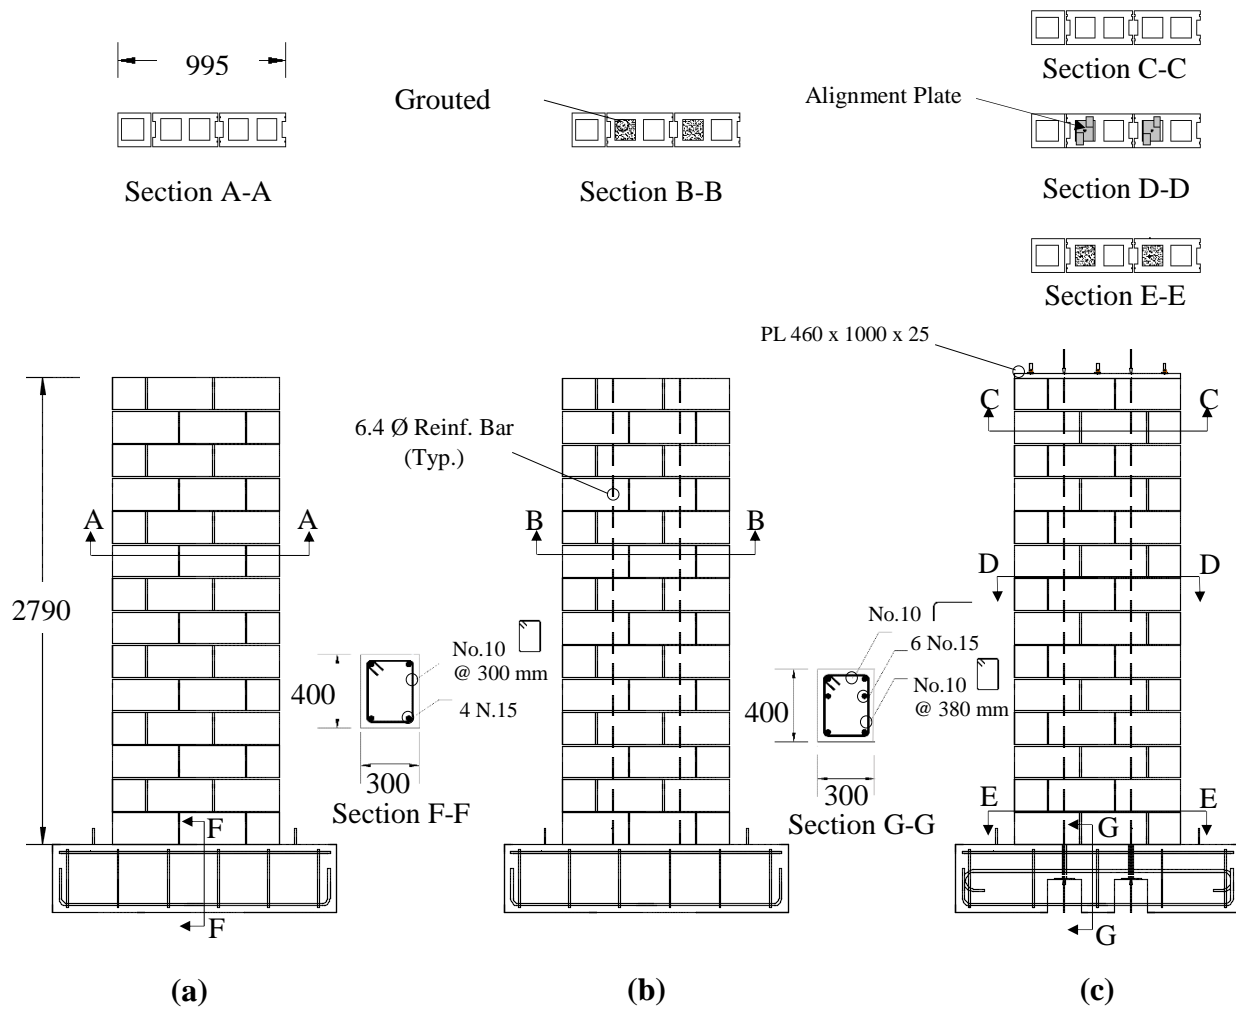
Cross-section and elevation of the wall specimens: (a) unreinforced walls, (b) conventionally reinforced and grouted walls, and (c) walls with unbonded reinforcement. (dimensions in mm).
